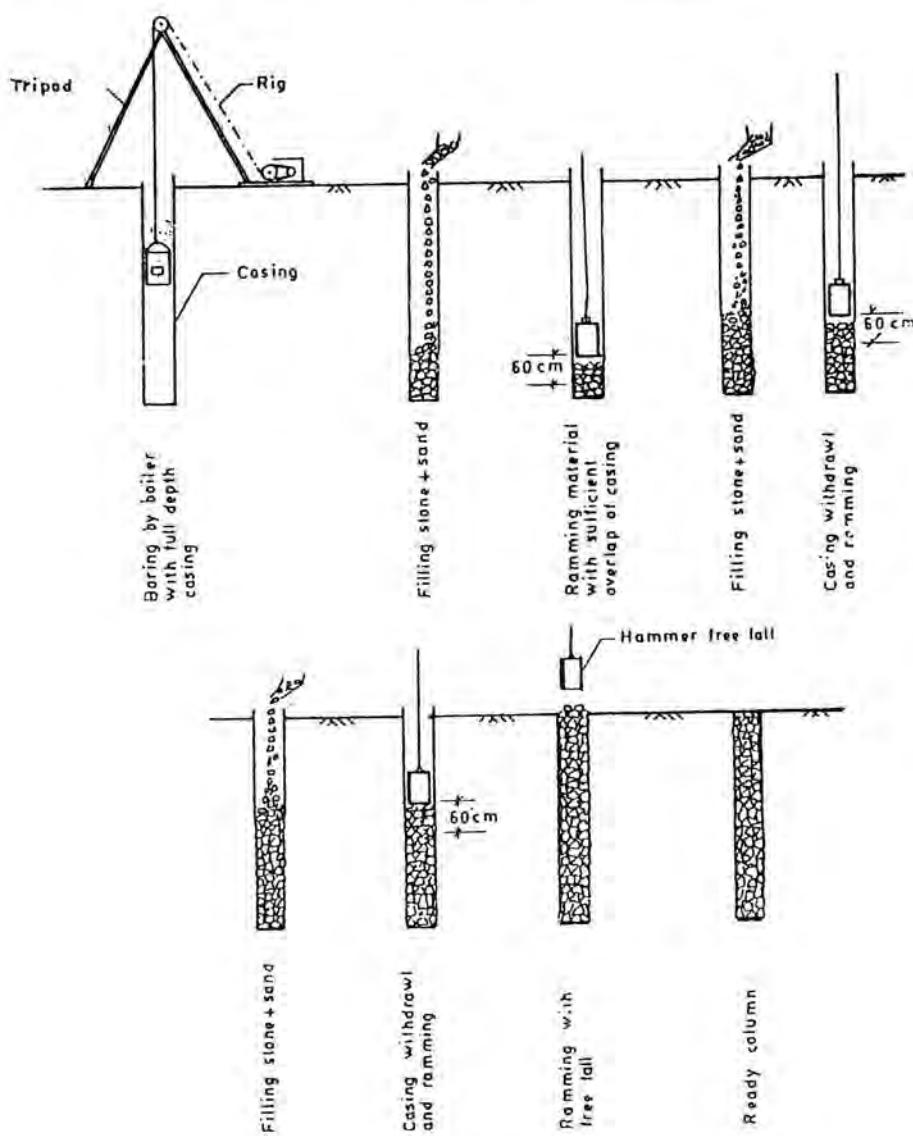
Installation of Stone Columns Through Cased Boreholes (Datye, 1982)
